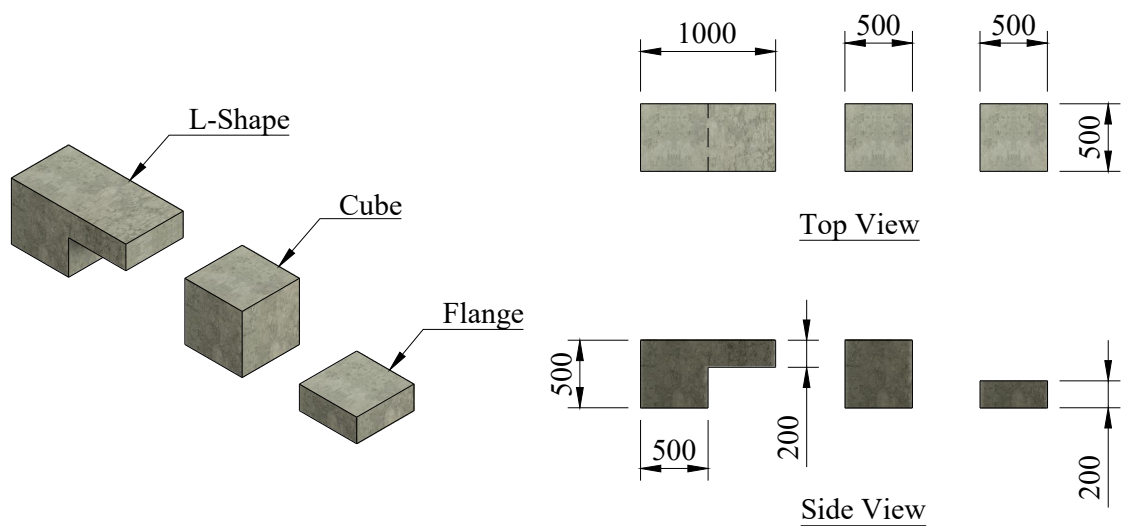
Dimensions of casted shapes: Cube, Flange, and L-Shape (all dimensions in mm).
